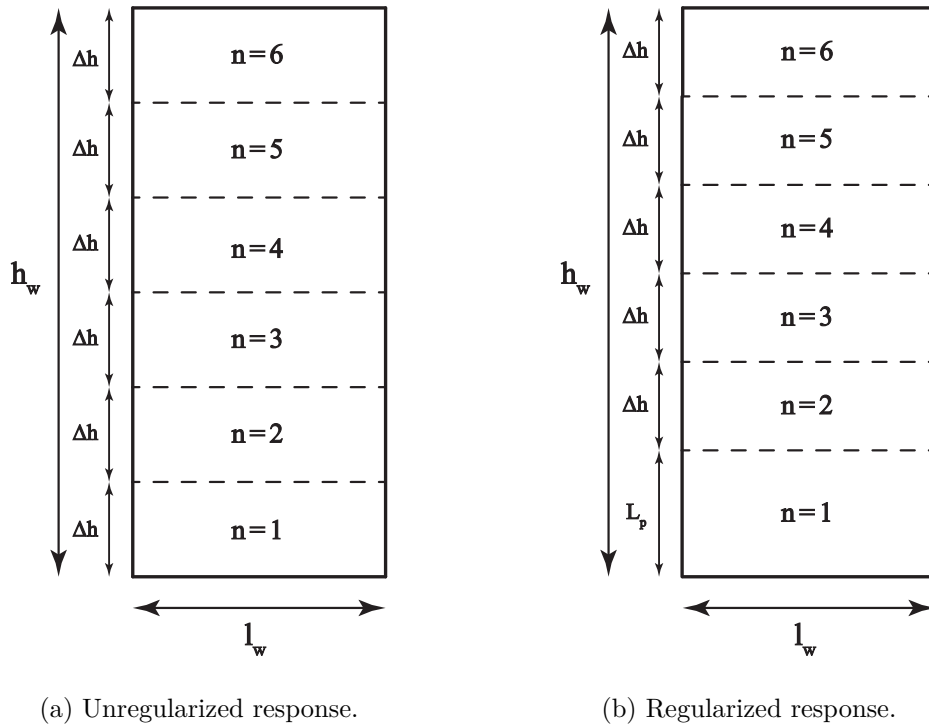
Layout of wall model vertical discretization for  $n=6$  E-SFI elements.
